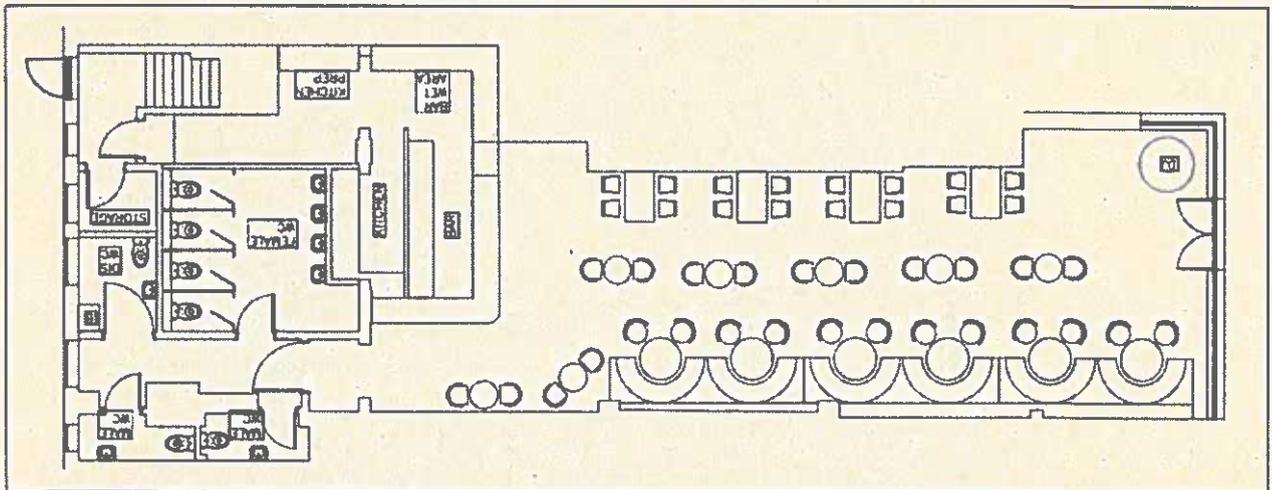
Ground Floor – Restaurant / Cocktail Bar [Front of Bldg to right]
